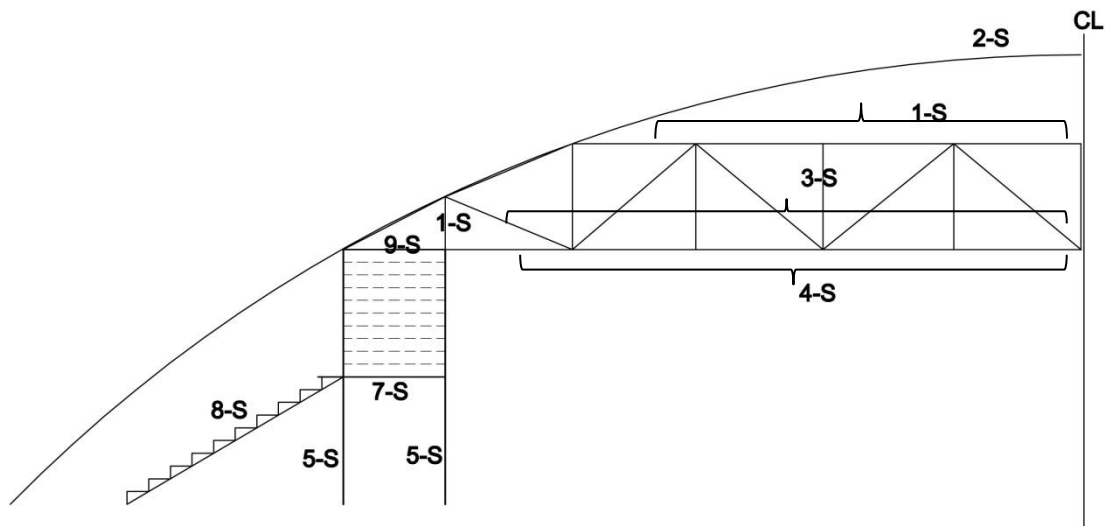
Section ID for elements of single span truss bridge-(Capstone project) (A7)
